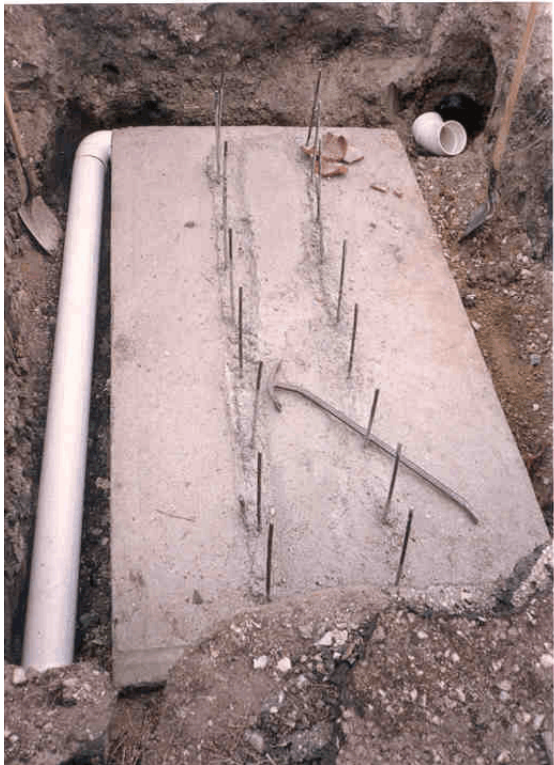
Vertical Rebar in Concrete Bridge Supports.
